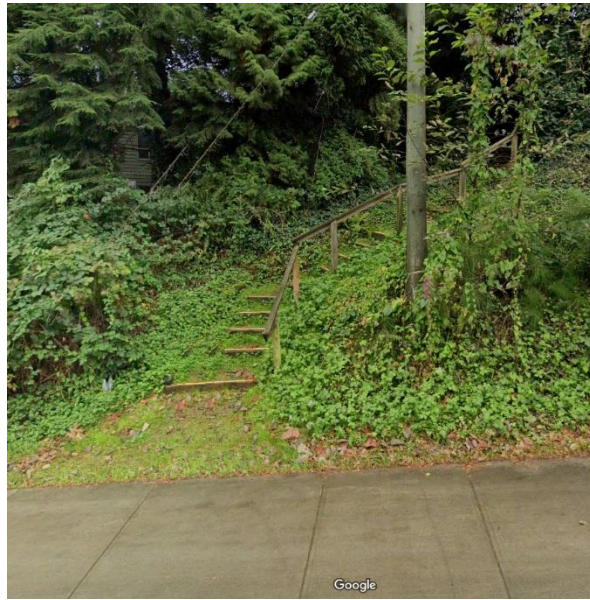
Bottom of existing walkway interfacing Clarke Road sidewalk
